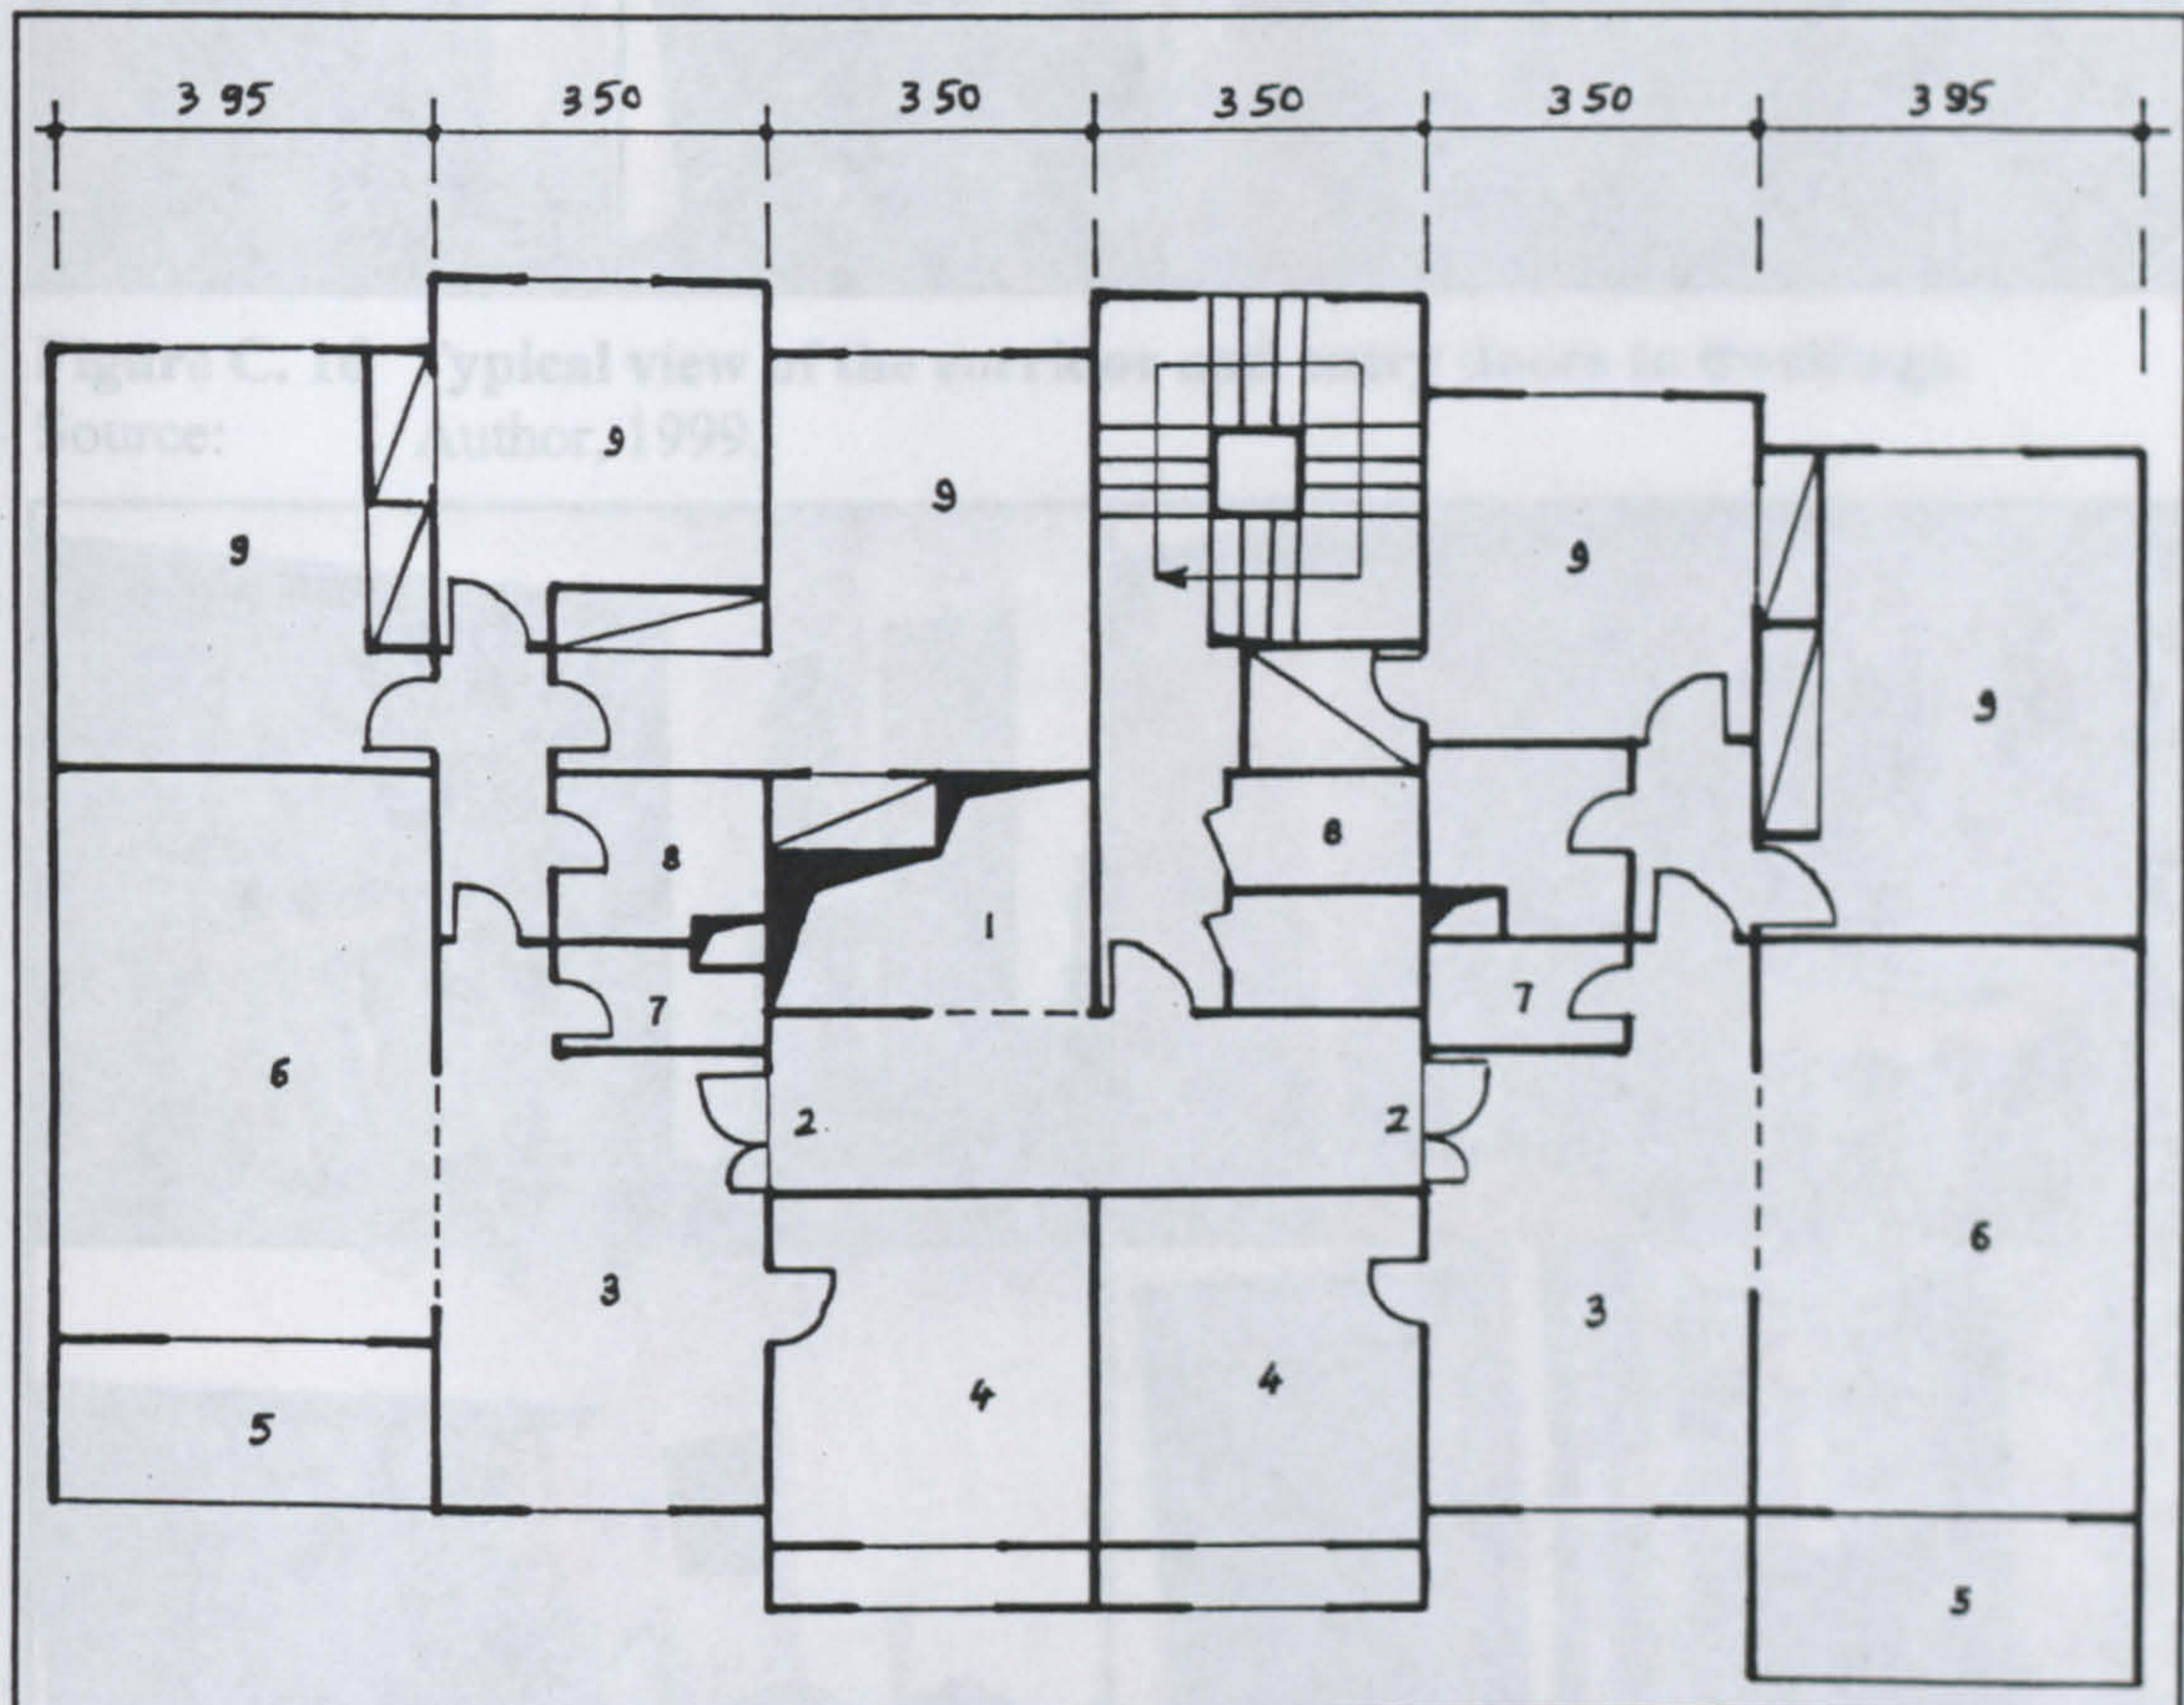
A typical building floor plan with two dwellings at east and west sides of a link corridor.
